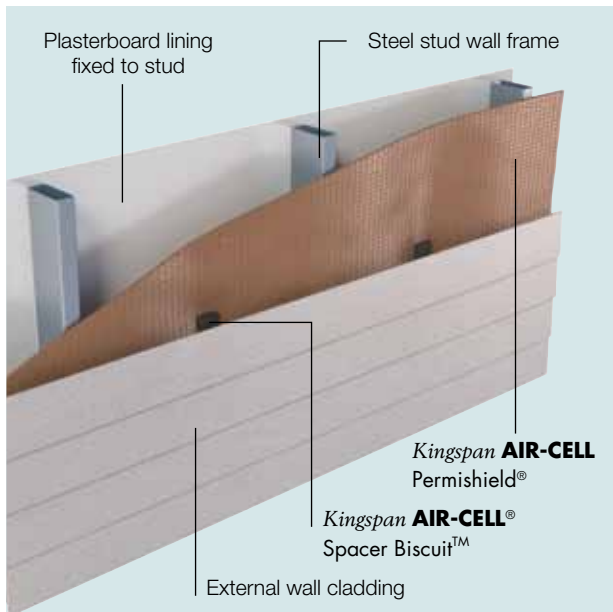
Kingspan AIR-CELL Permishield® on steel-framed wall
